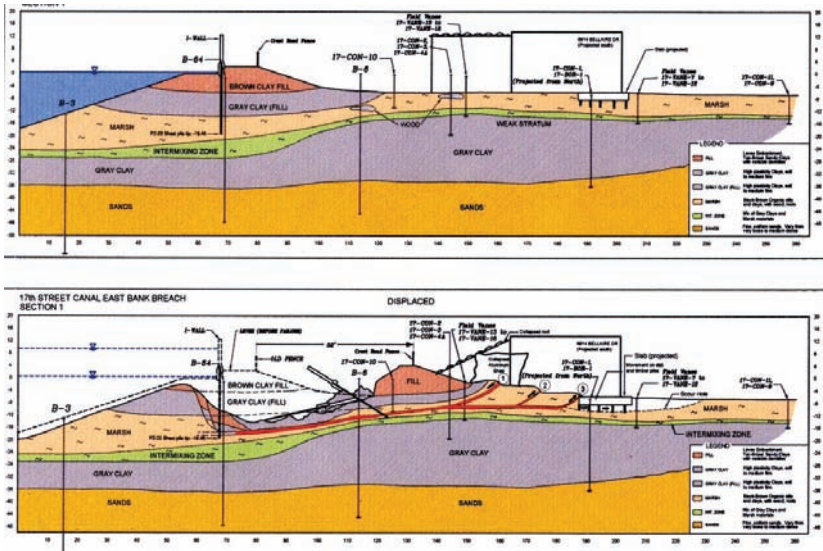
Breach at the Seventeenth Street Drainage Canal (Seed et al., 2008c)
